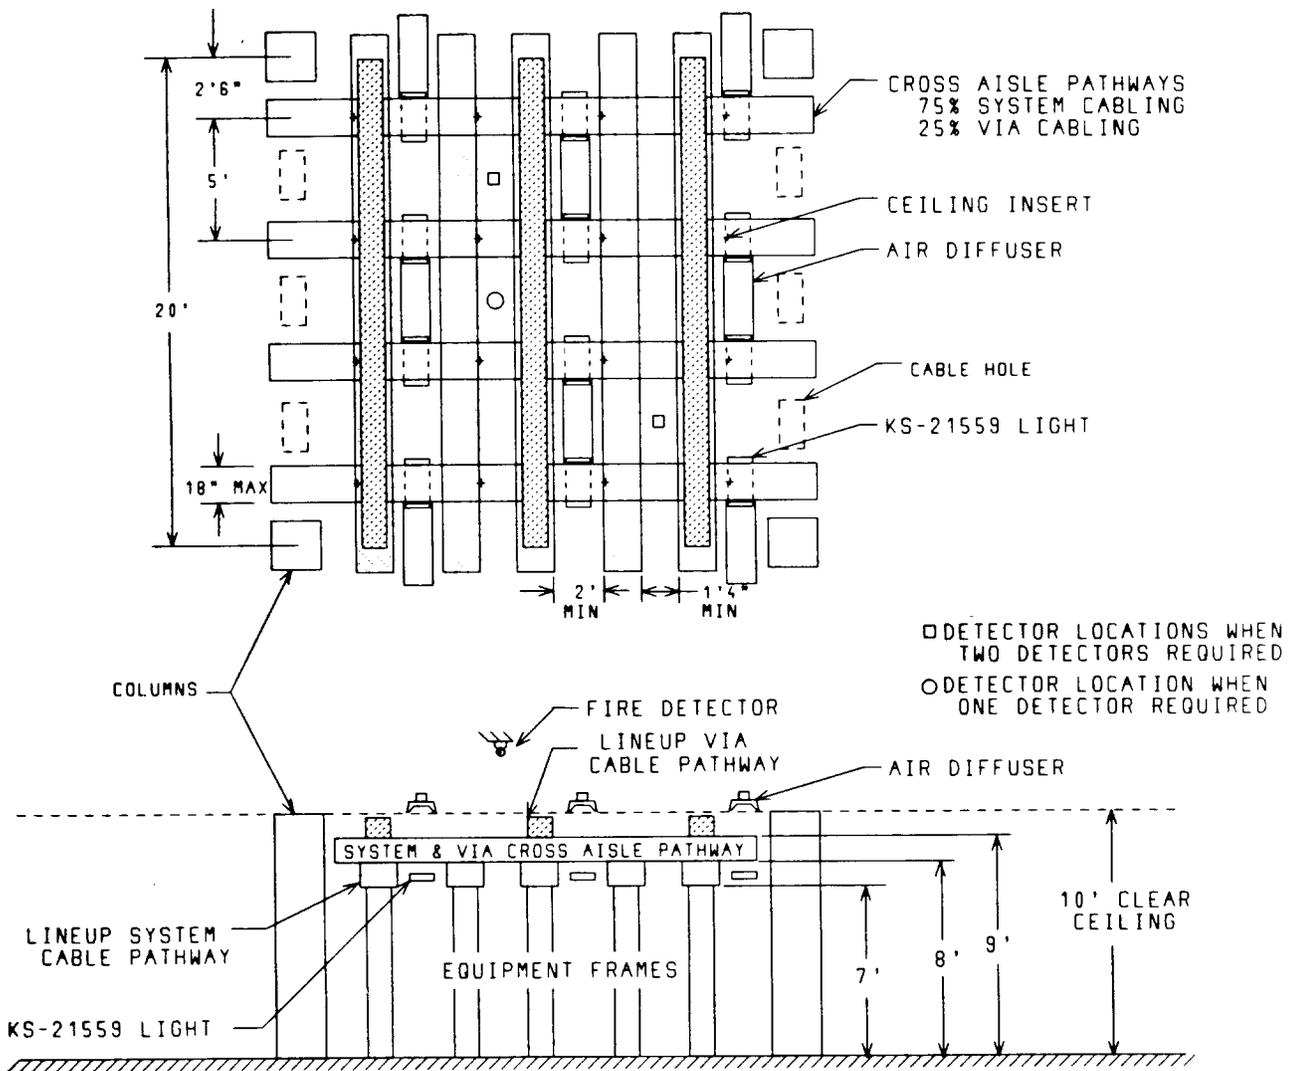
Cable Pathways Plan for 12-Inch Deep Frame Areas
